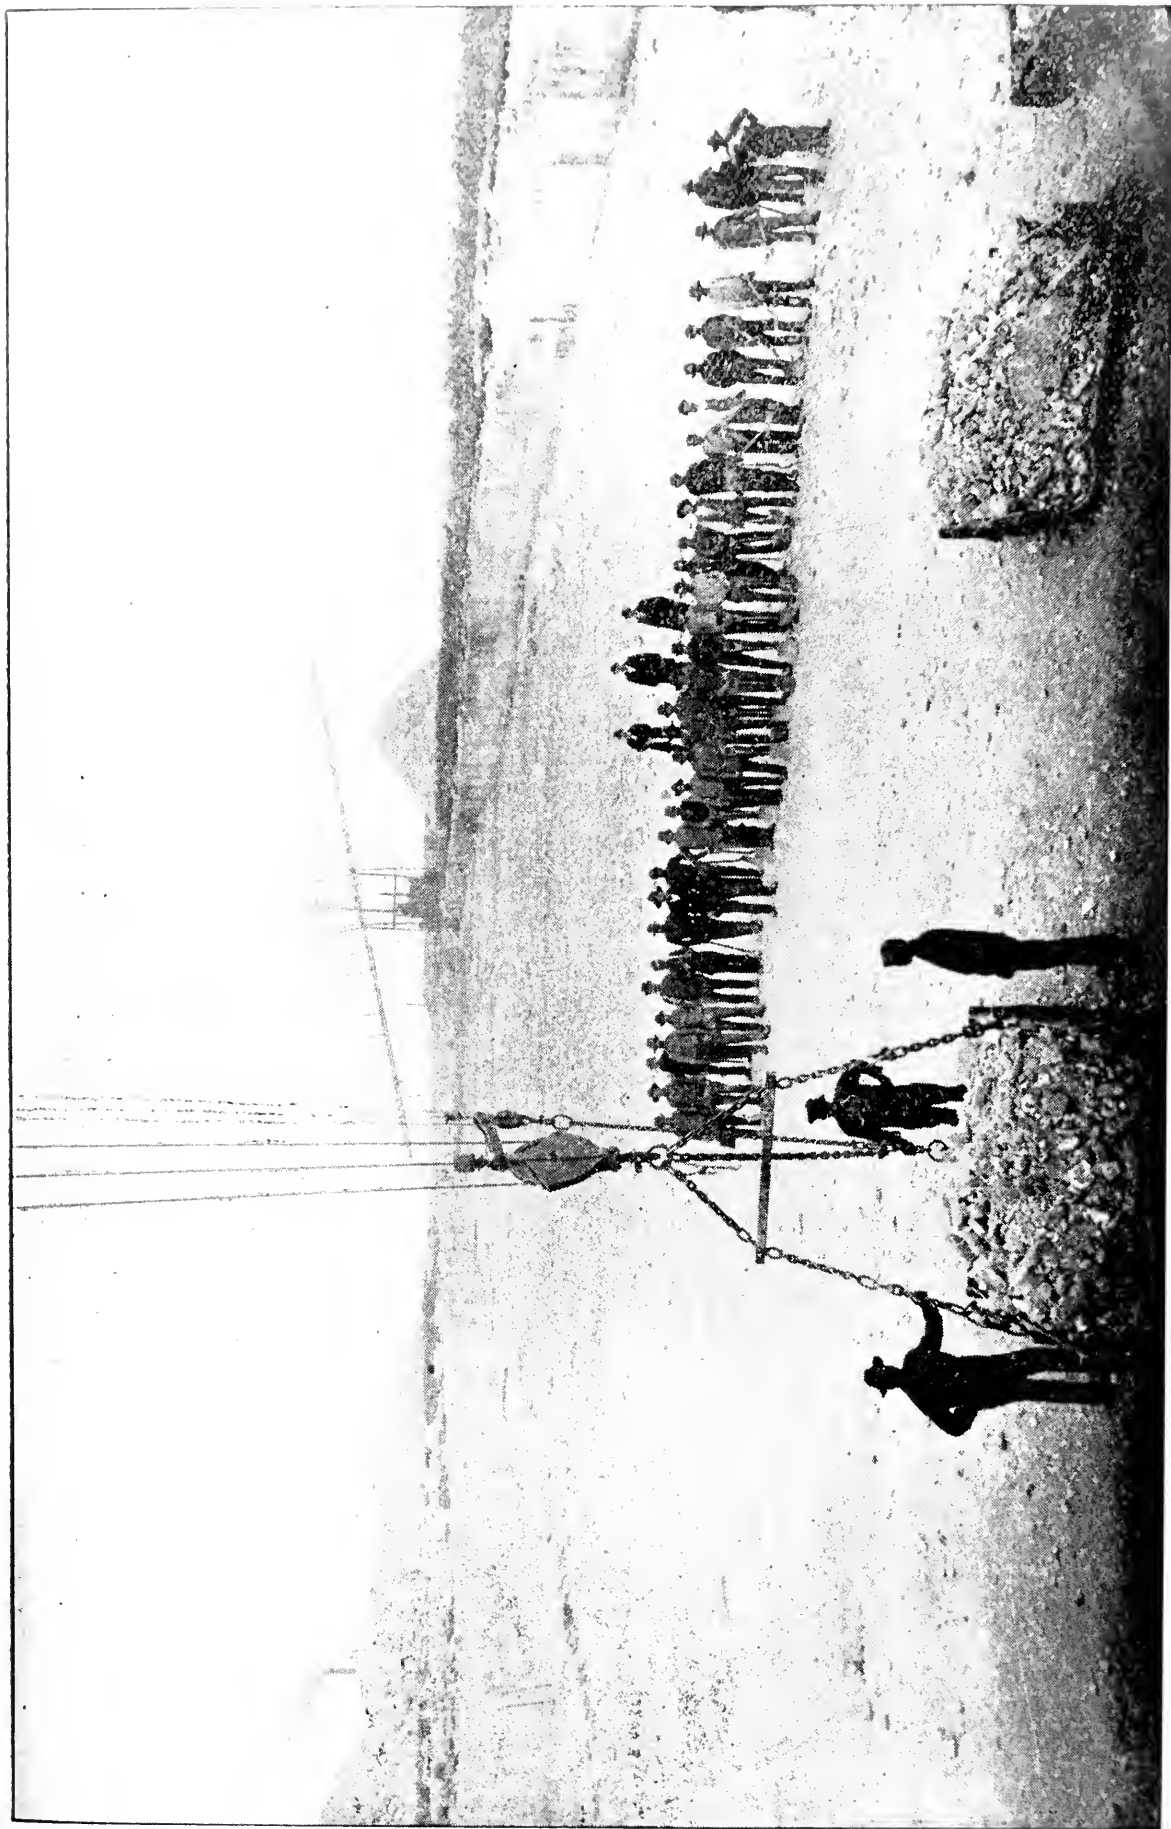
METHOD OF REMOVING ROCK FROM DRAINAGE CHANNEL AND WATERWAY. CABLE HOIST SKIPS.
